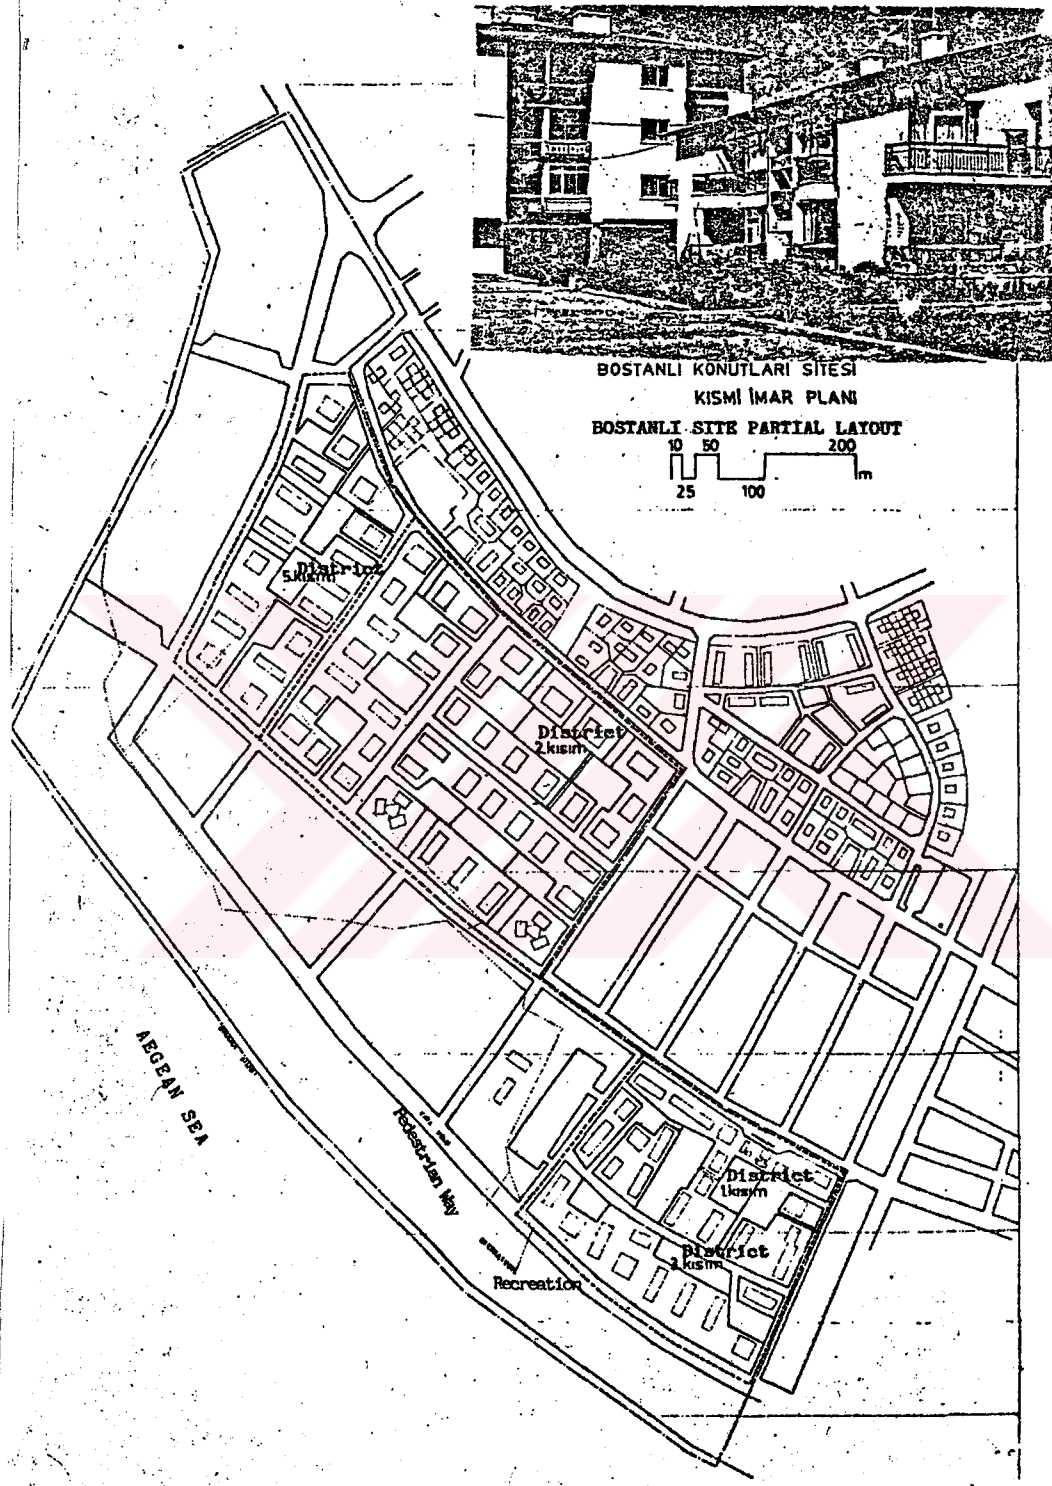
Site Plan of Deniz Bostanlığı in Izmir
